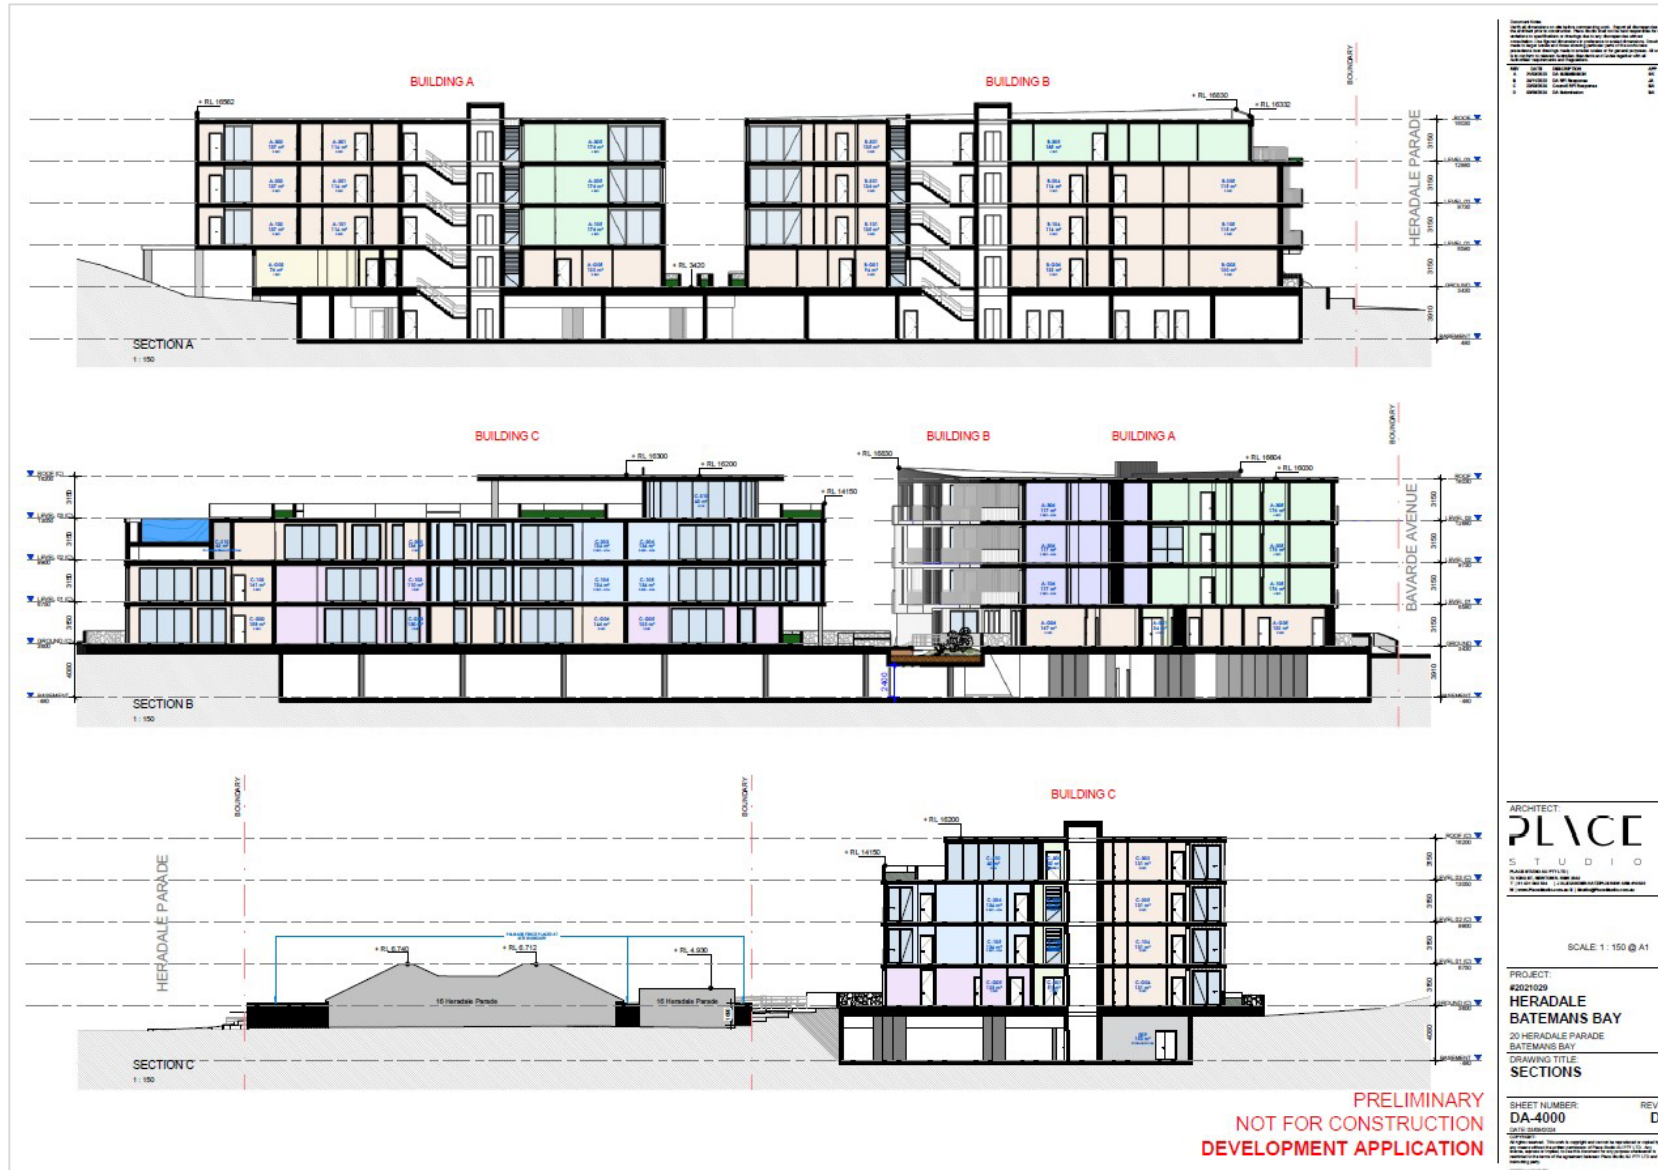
Section plan of the proposed works (Source: Place Studio 2024)
